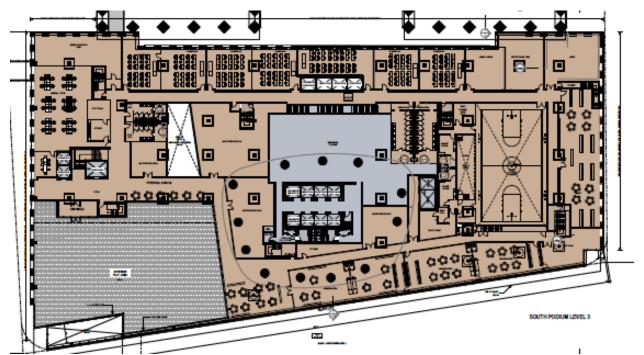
3rd Floor Plan (2021 Site Plan Application submission)
